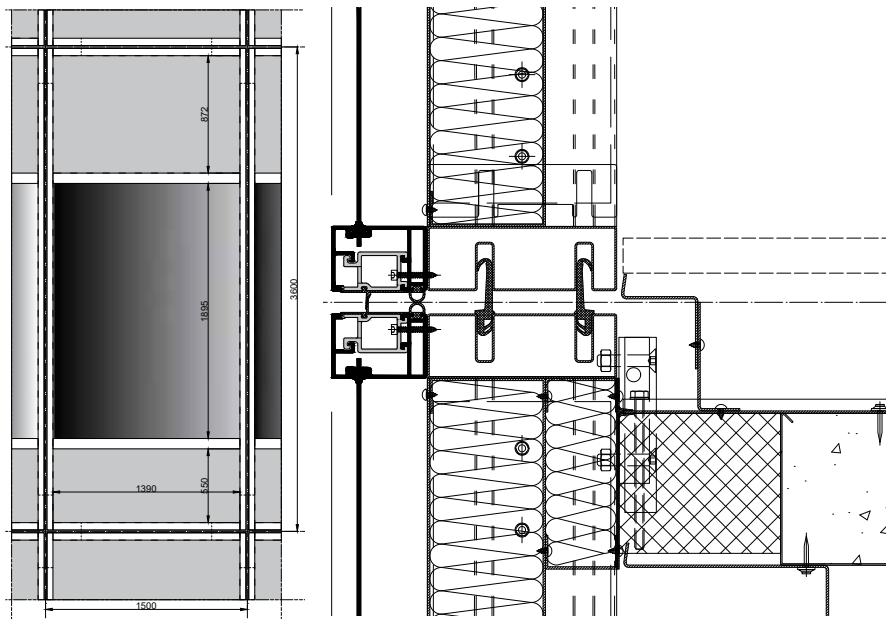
Type 2 elevation and vertical section detail n.t.s. (source: own image)
